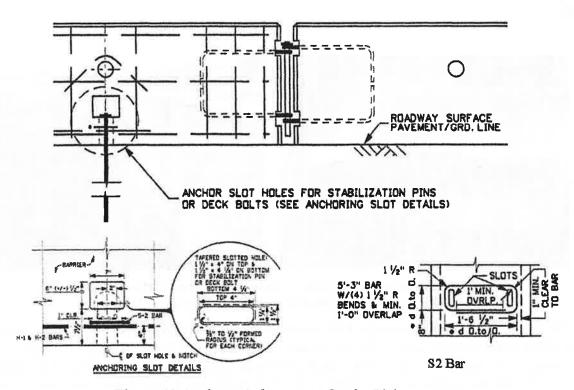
Anchor reinforcement for the Idaho system Source: Idaho DOT G-2-A-1 sheets 1 & 2
